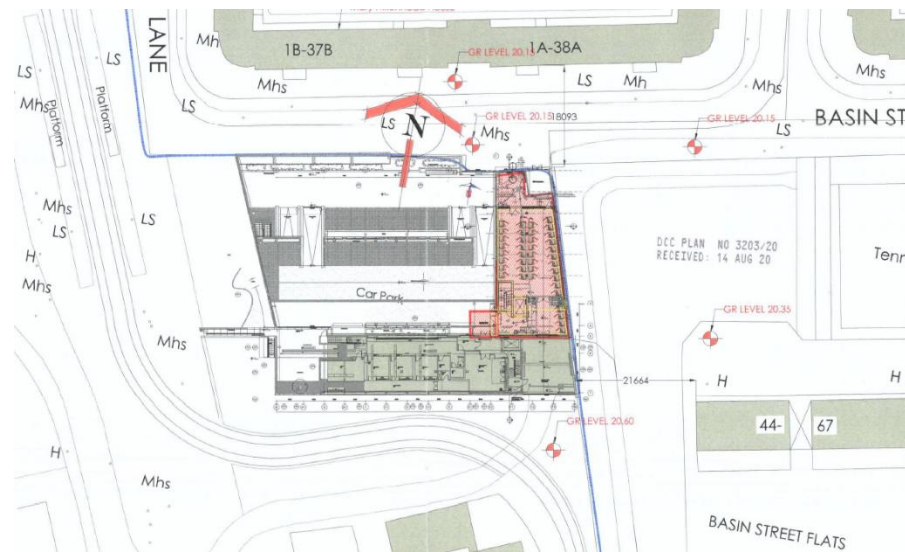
extract from 'Site Block Plan' from application drawings by Eoin Condon Architect
